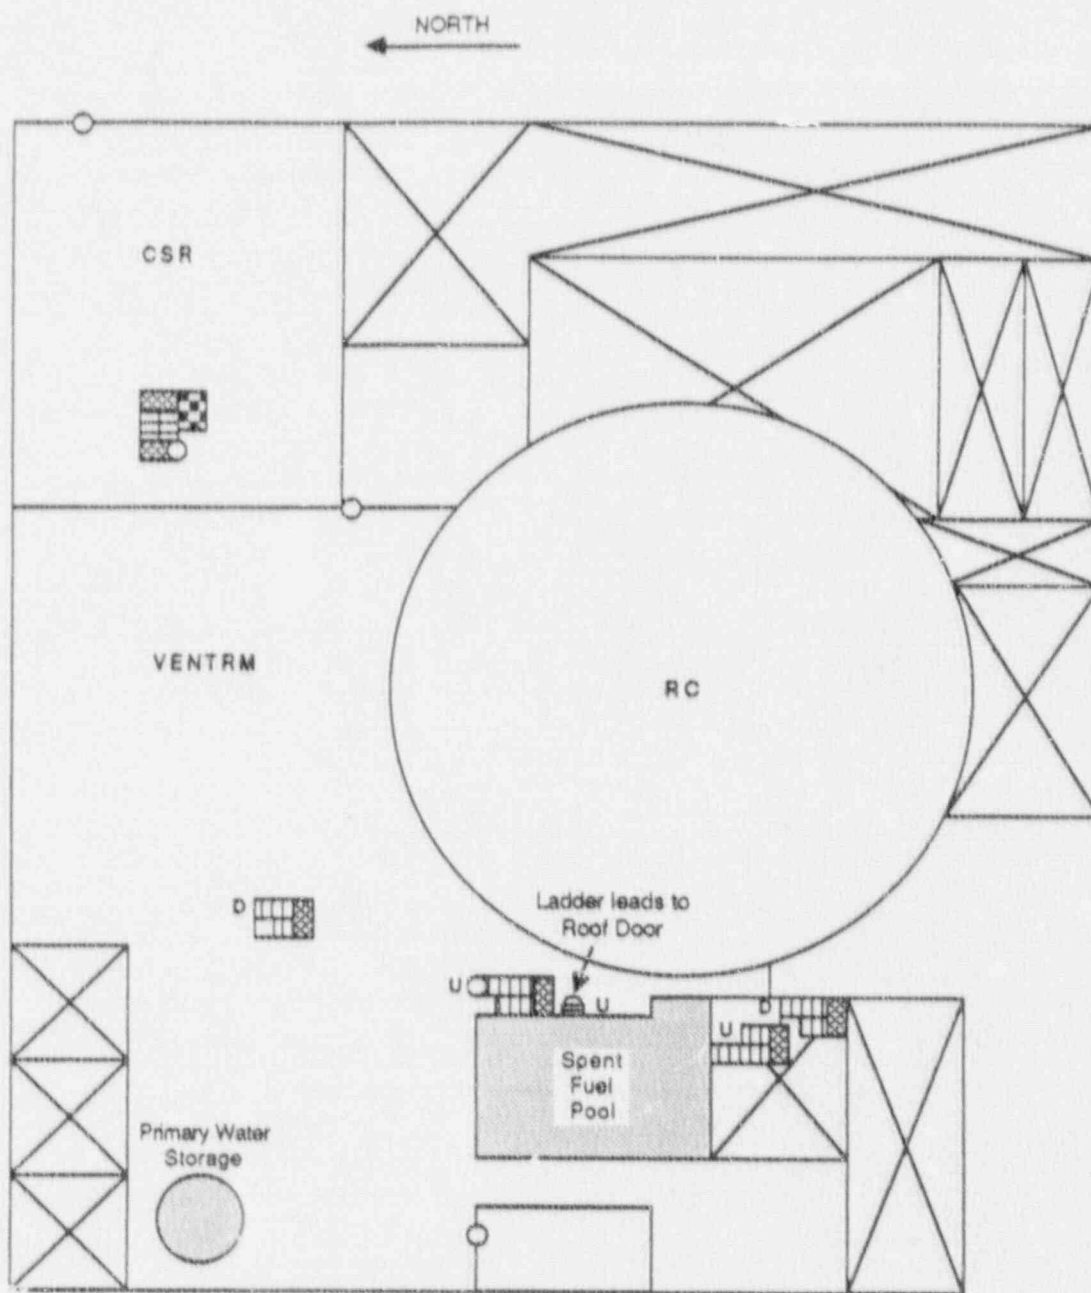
Fort Calhoun Auxiliary Building & Containment Intermediate Floor (Elevation 1025')
